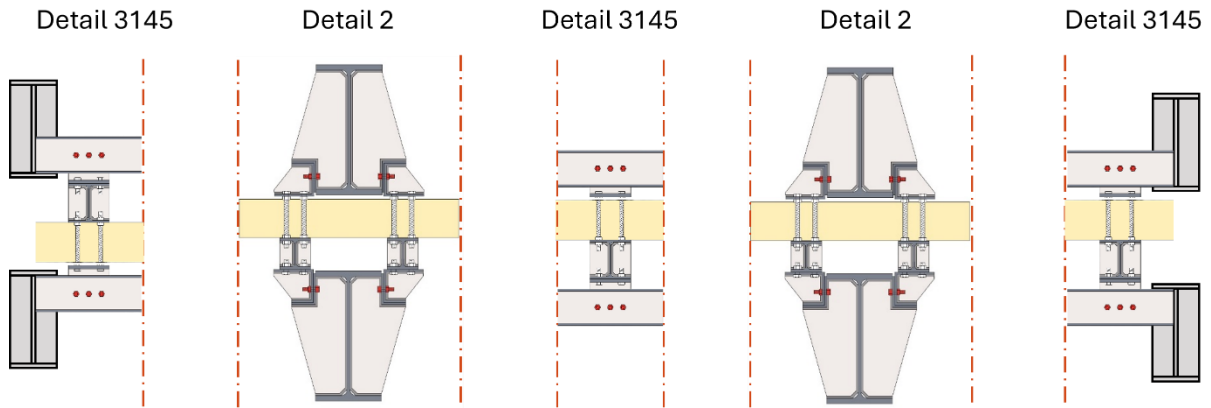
Building configuration Detail 2 + Detail 3145.
